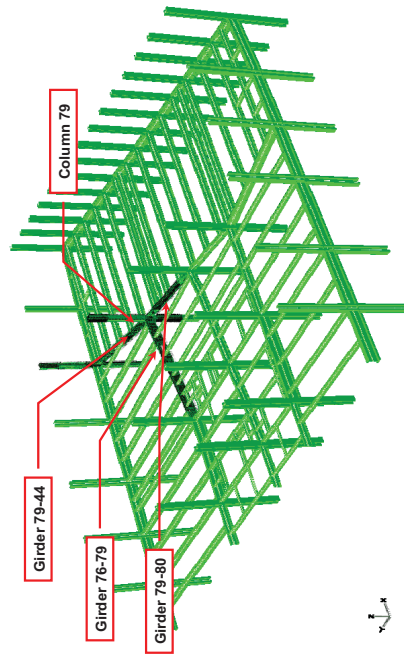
3D image of structural fire model showing the beams of level 13 and columns spanning from the level below to the level above. (Slab surface not rendered to provide clarity of beam / girder locations)
